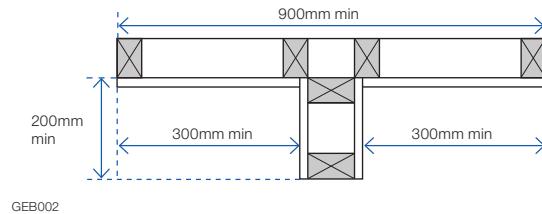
WALL INTERSECTION (GIBFIX® FRAMING SYSTEM)
